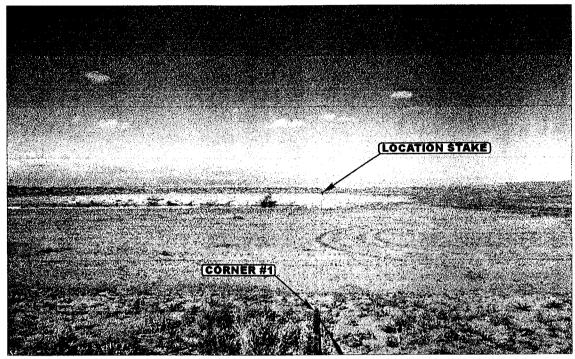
PHOTO: VIEW FROM CORNER #1 TO LOCATION STAKE
